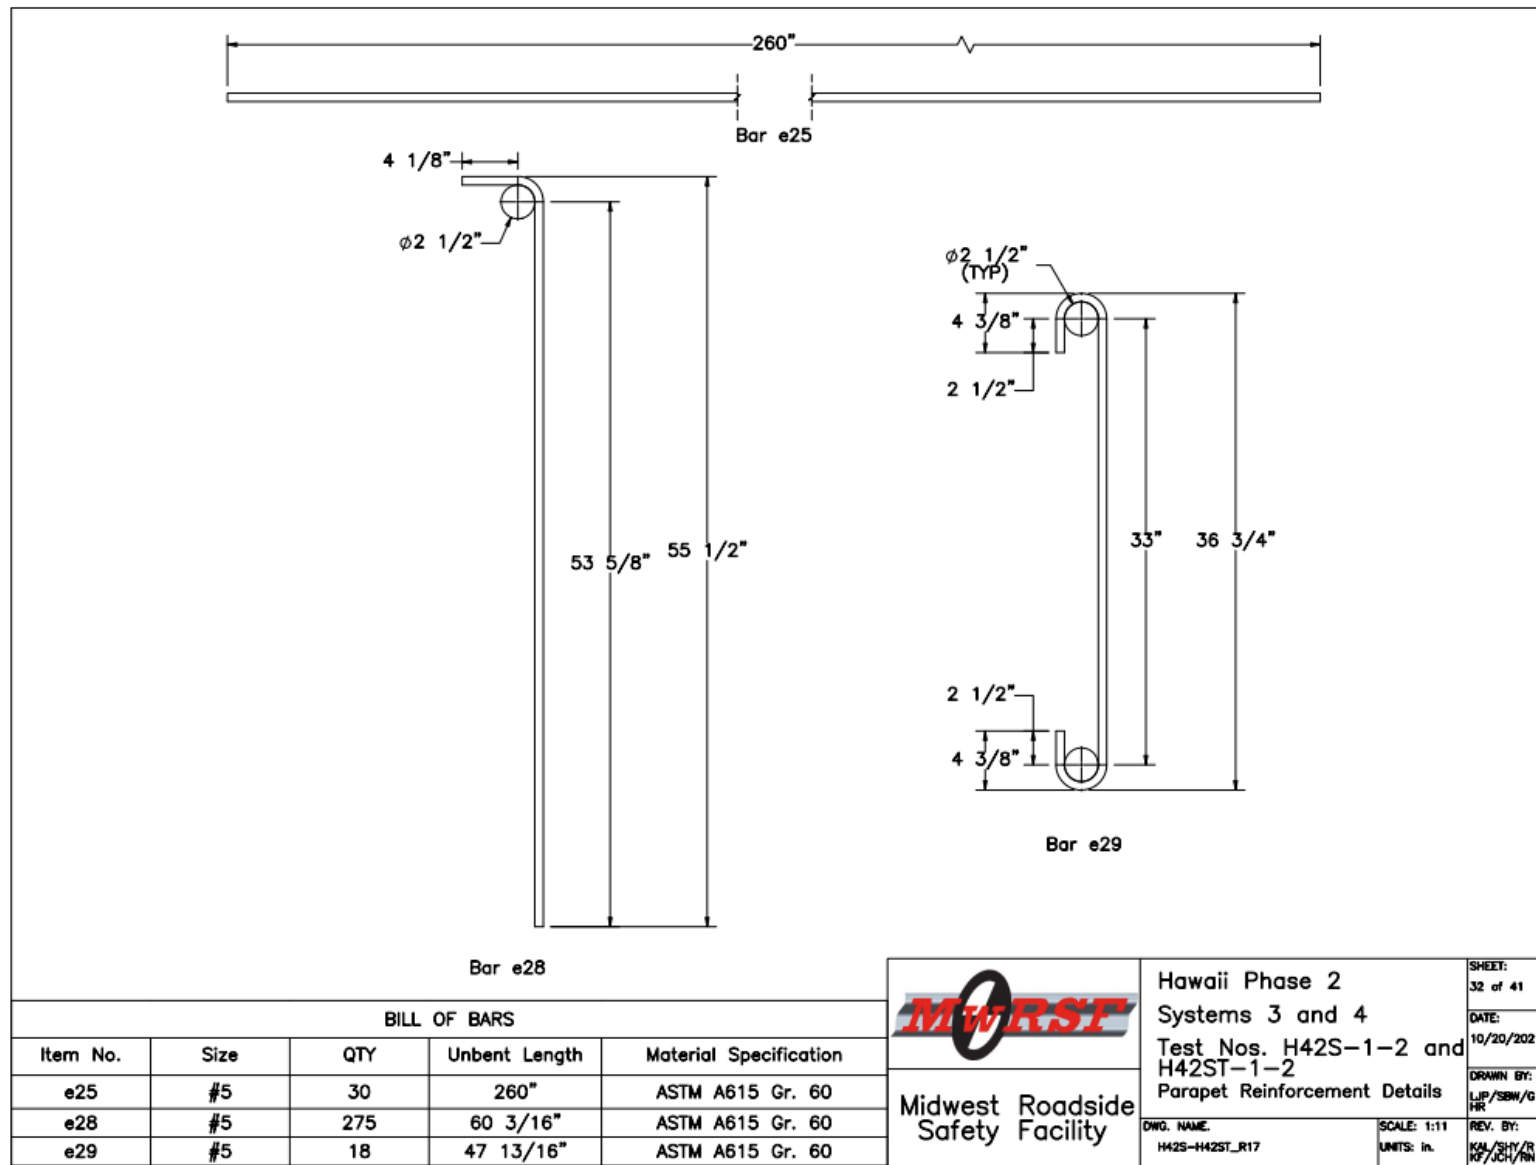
Parapet Reinforcement Details, Test Nos. H42ST-1 and H42ST-2
